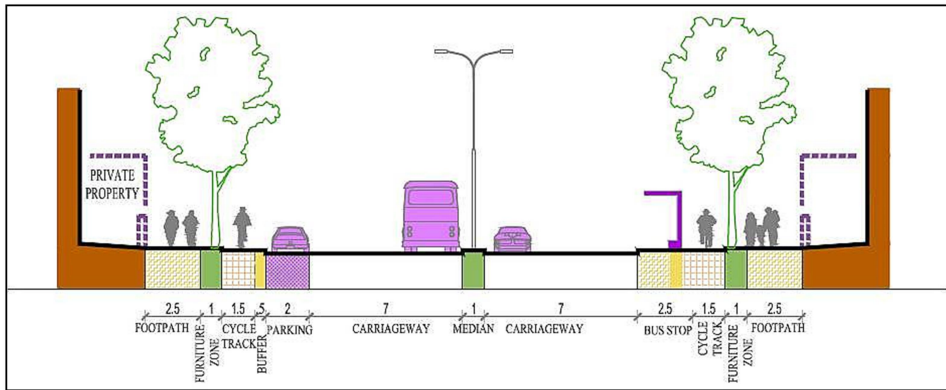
Street design proposal for 30 m wide road with footpath, cycle track, parking, bus stop and traffic carriageway
